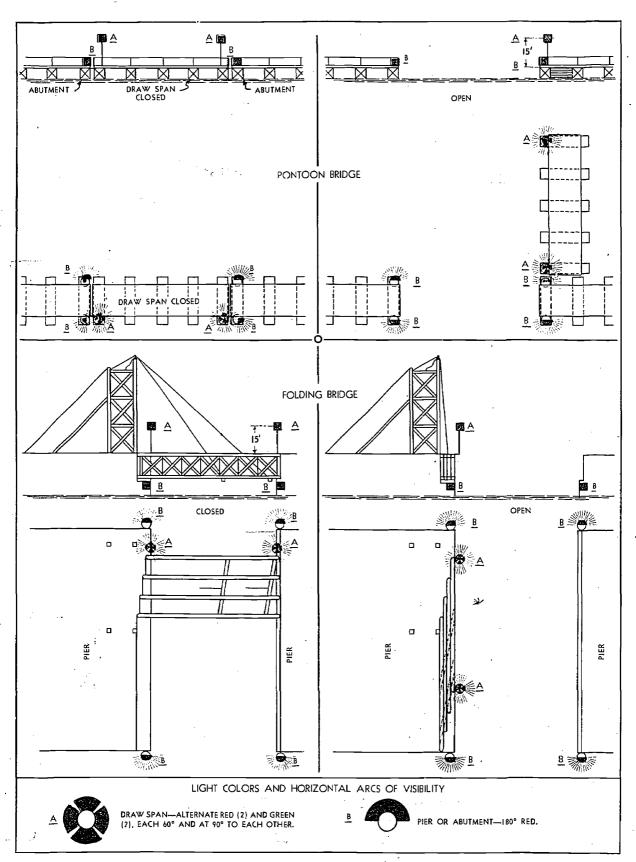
Minimum lighting requirements for single-opening draw bridges.
